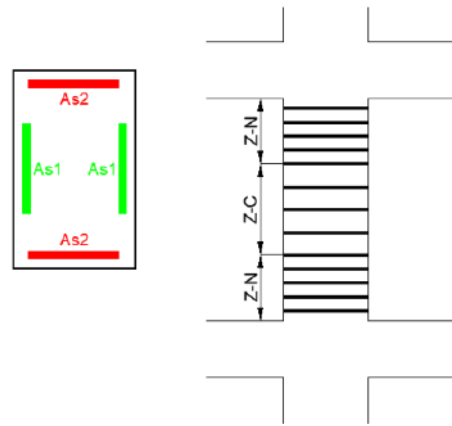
Column cross-section reinforcement layout and longitudinal confinement zones.
